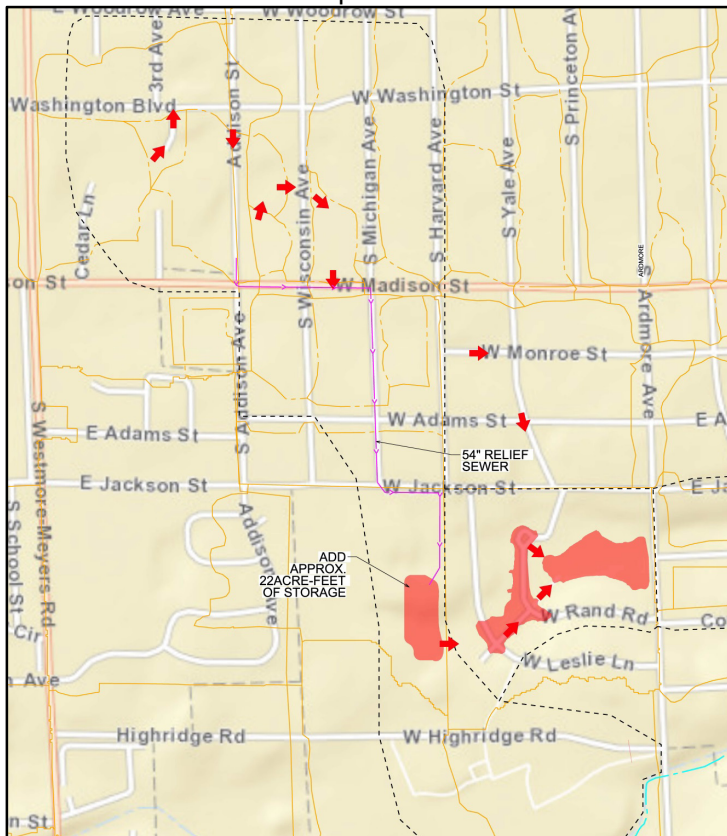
A – Proposed Improvements for Proposed Alternative 1b
